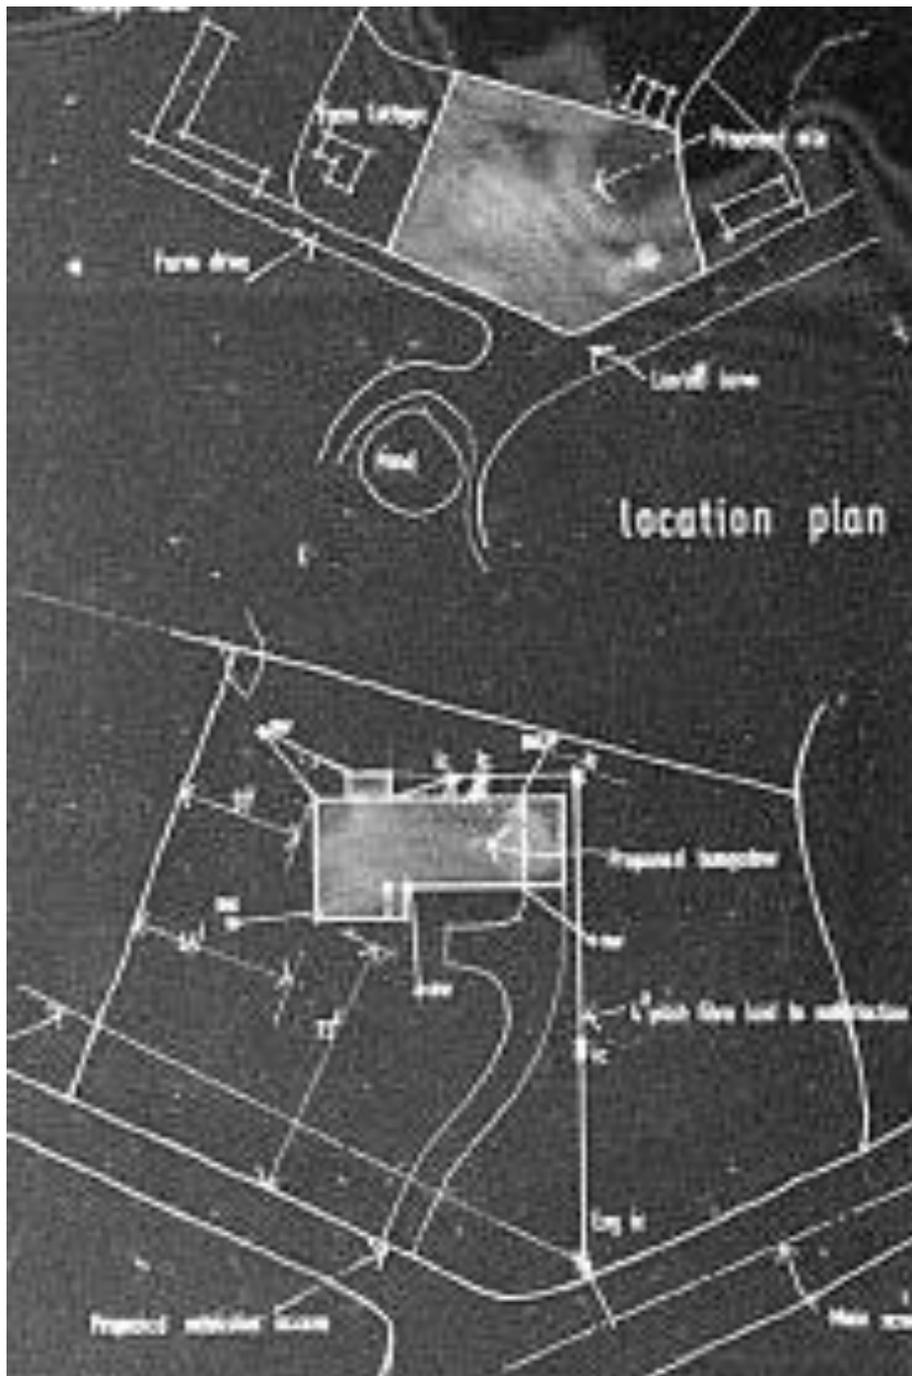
planning permission 70/1295 site location plan (extract) showing the curtilage of "Parkside"; the full parcel of land between Old Farm House and Snows Cottages.
